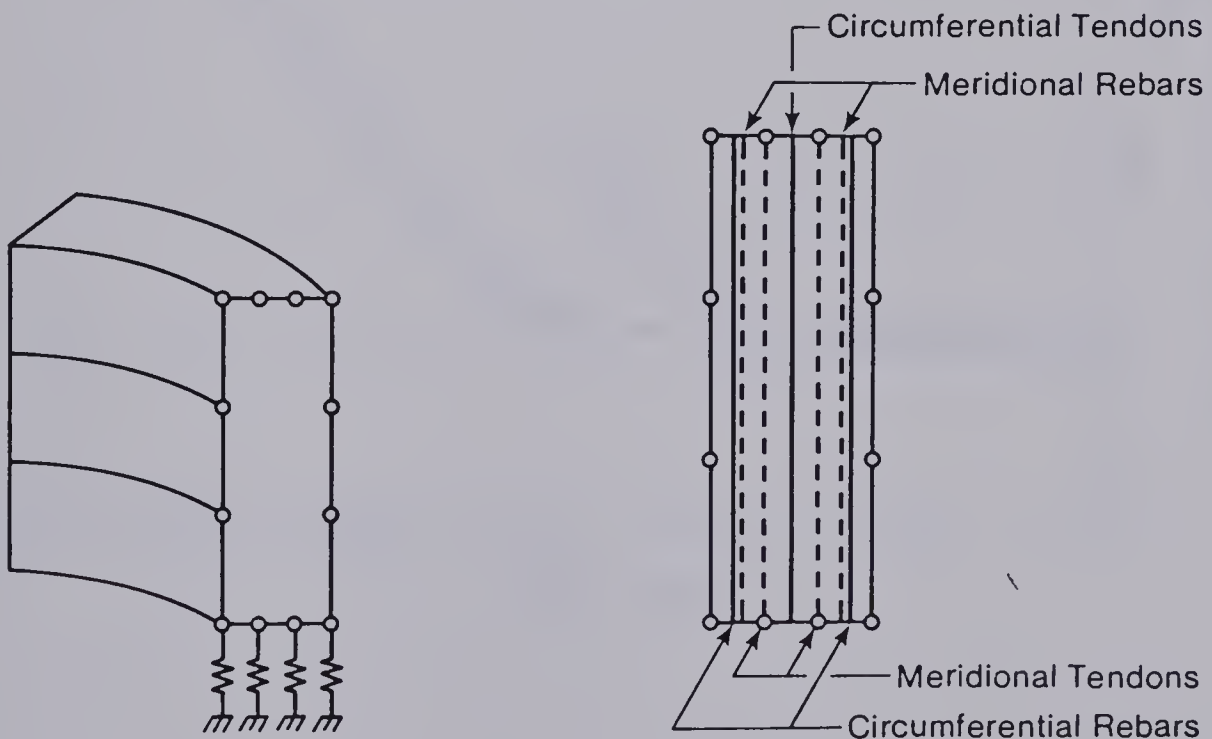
Finite Element Modelling of Wall Segment Specimen
